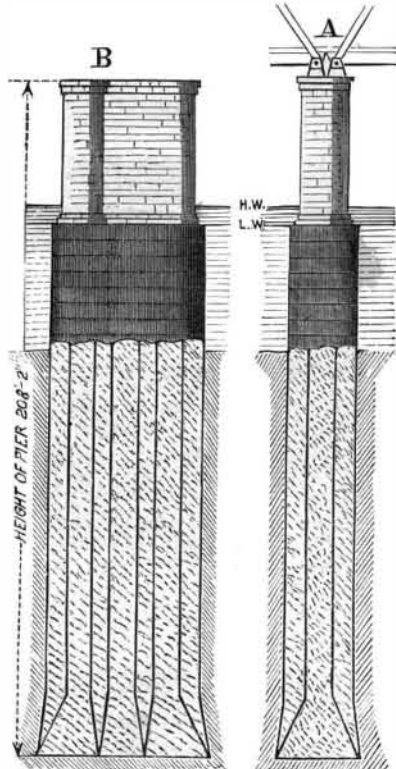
SECTIONAL ELEVATION OF PIER.
